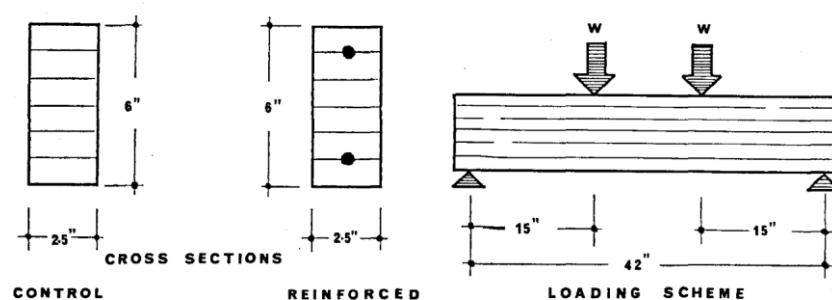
Details of loading scheme and cross sections of experimental beams (Lantos 1970).
